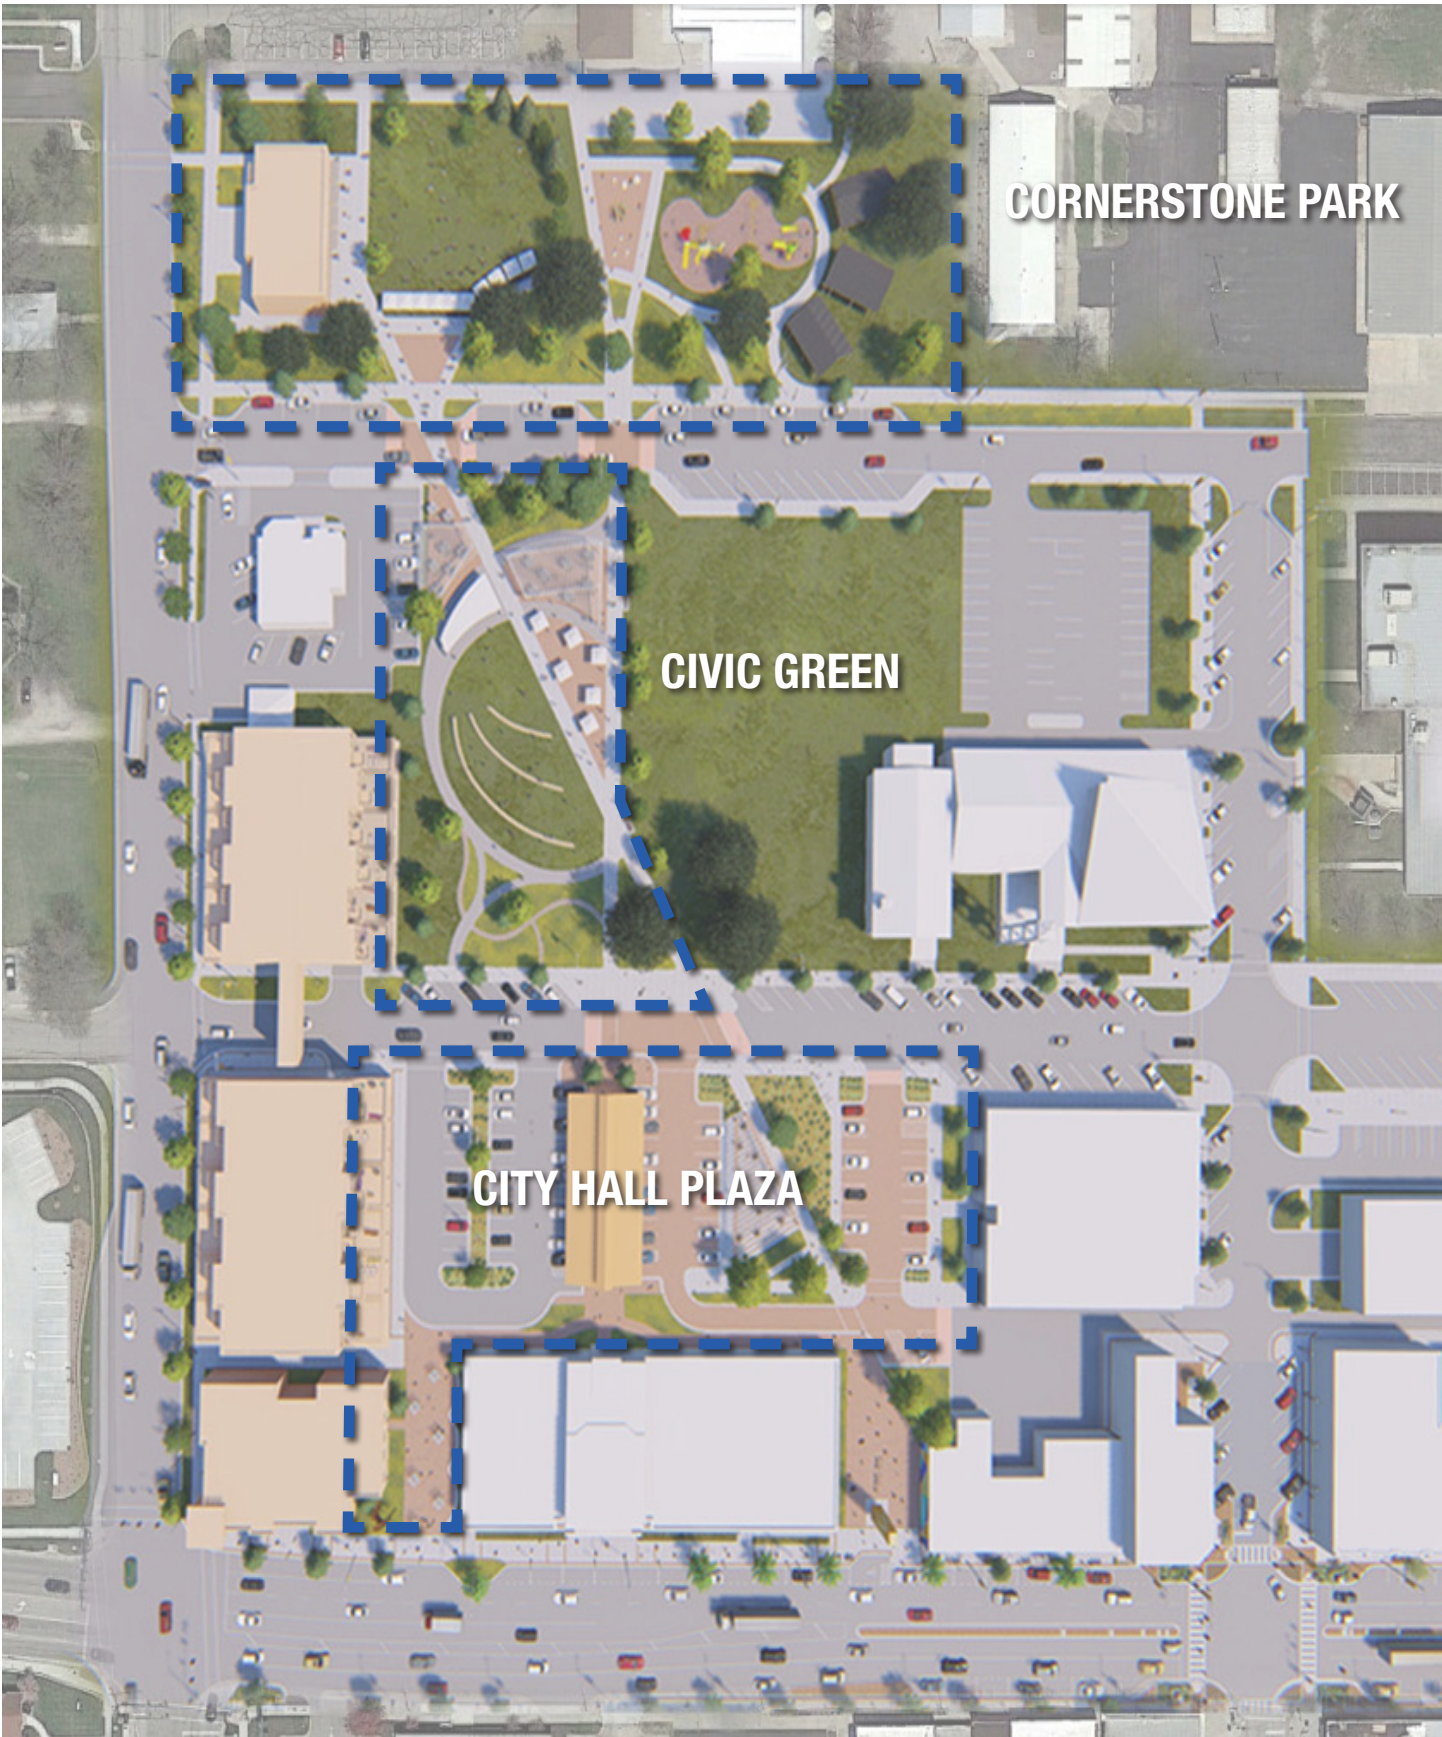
Figure XIV - Plan view of proposed public spaces in Downtown Gardner
